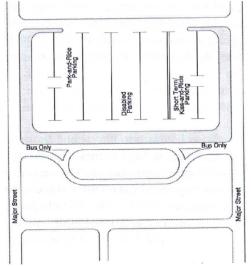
Park - and-Ride Facilities along Two Adjacent Streets
